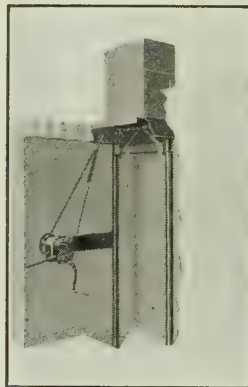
Shows Elevator in Areaway Flush with Sidewalk
